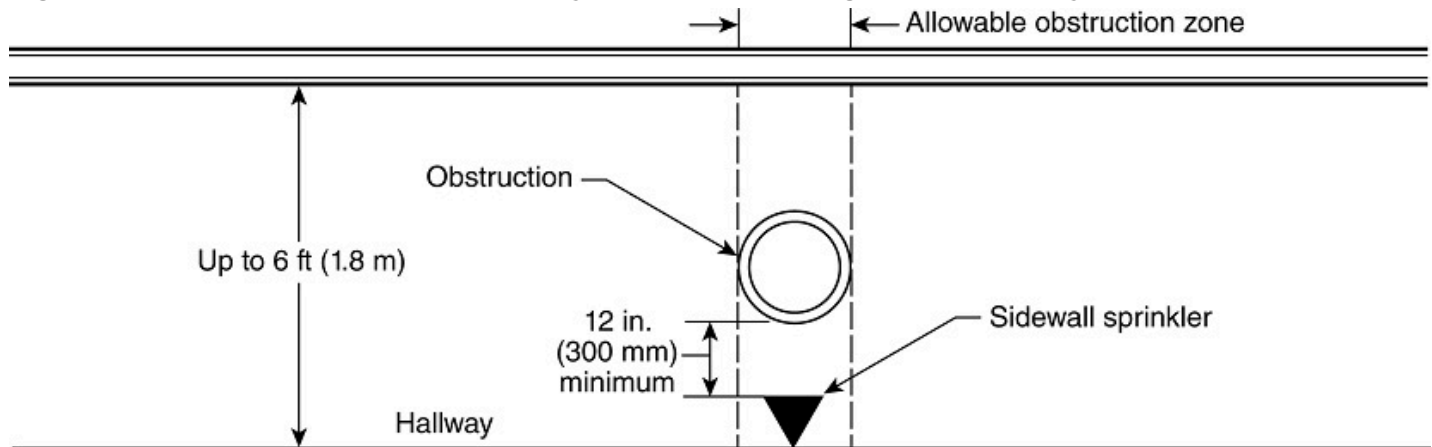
(d) Obstruction in Hallway (Extended Coverage Sidewall Spray Sprinklers).
